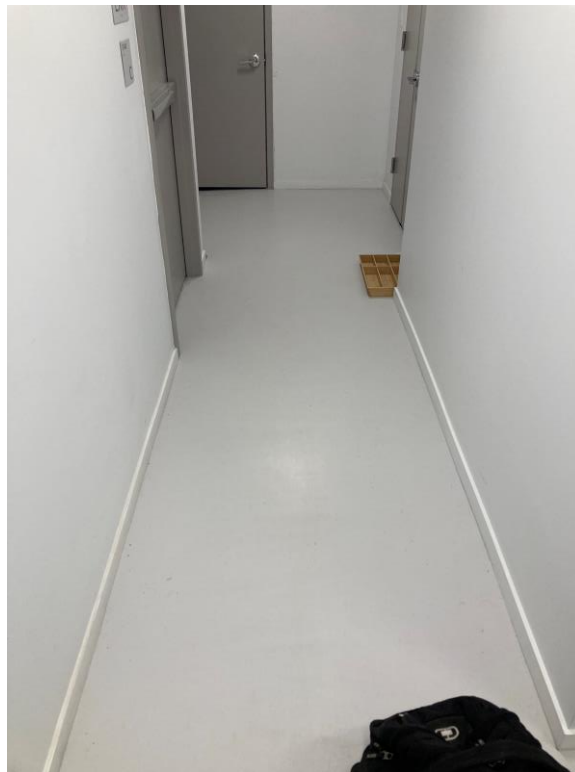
View of the finished cellar slab (facing southwest). Taken 7/25/2023.
